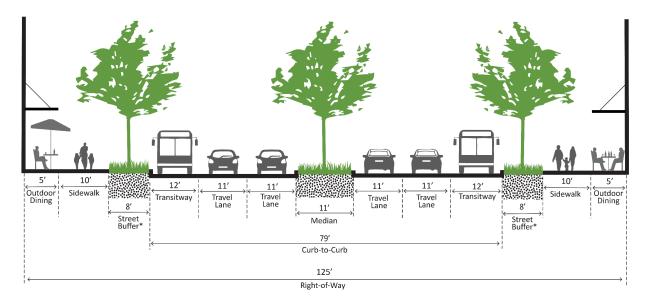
Georgia Avenue (M-8): Spring Street to Colesville Road, Looking North
